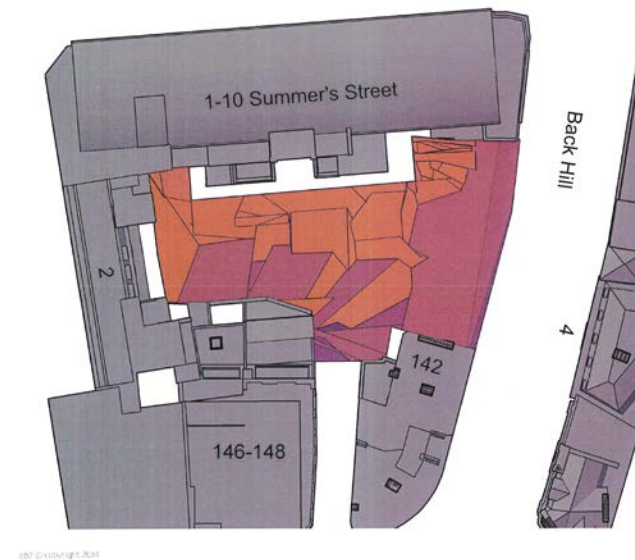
| RIGHT OF LIGHT ENVELOPE PLAN VIEW
